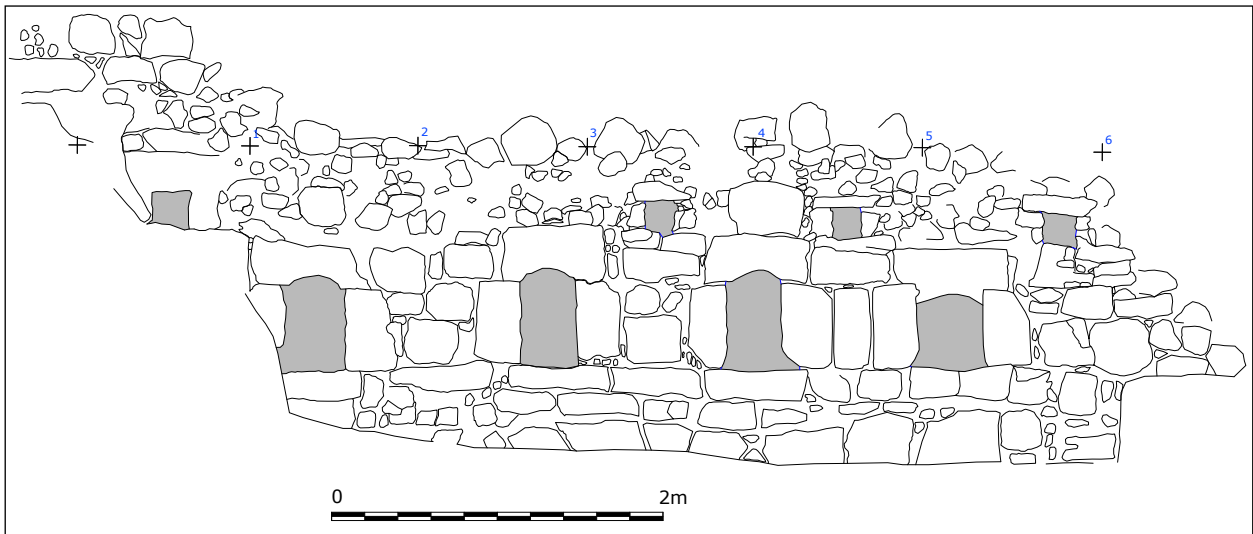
Upper Rawlins: elevation of west-facing wall of boiling train (shaded areas are voids)
